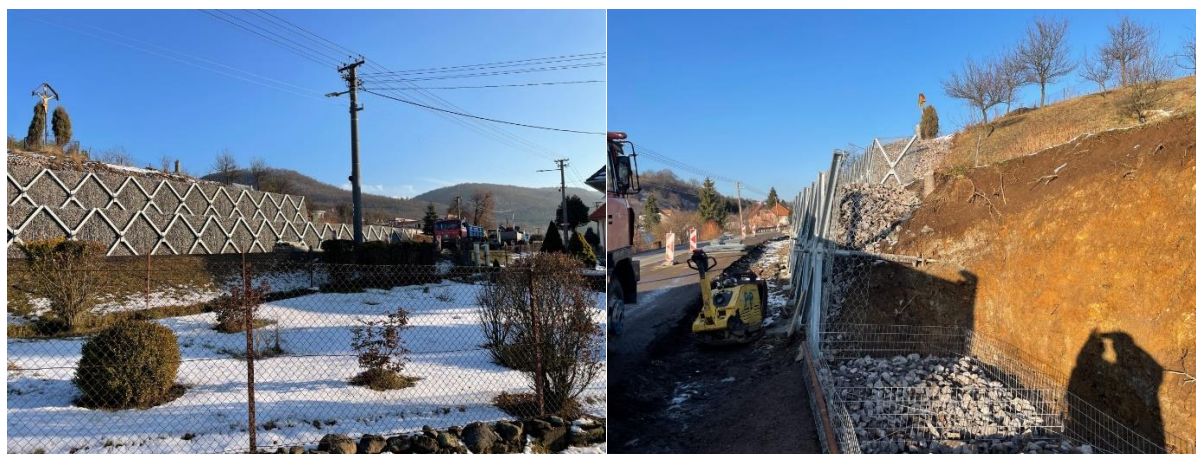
Left: View of the retaining wall - two-stage steel anchored structure; Right: The lower basket of the gabion retaining wall
